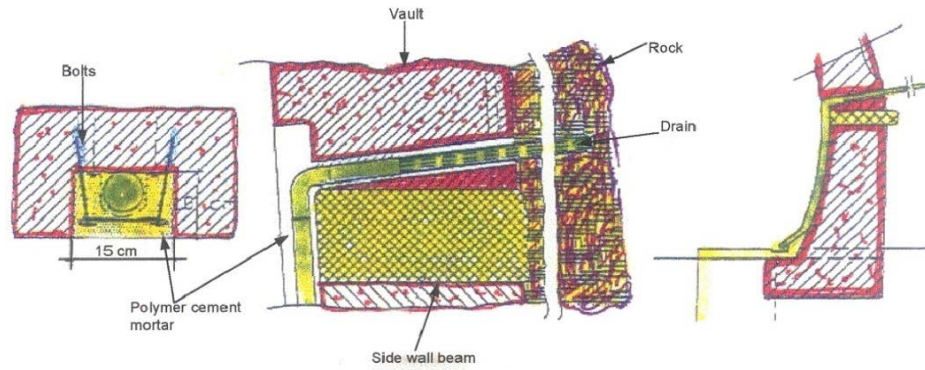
Radial drainage holes drilled through tunnel sidewall to relieve external water pressure. The pipe shown is encased in polymer mortar (Russell, 2001).
